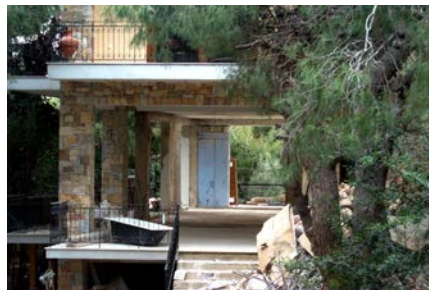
E: Demolition of the Damaged Infill Walls at the Ground Floor Level
